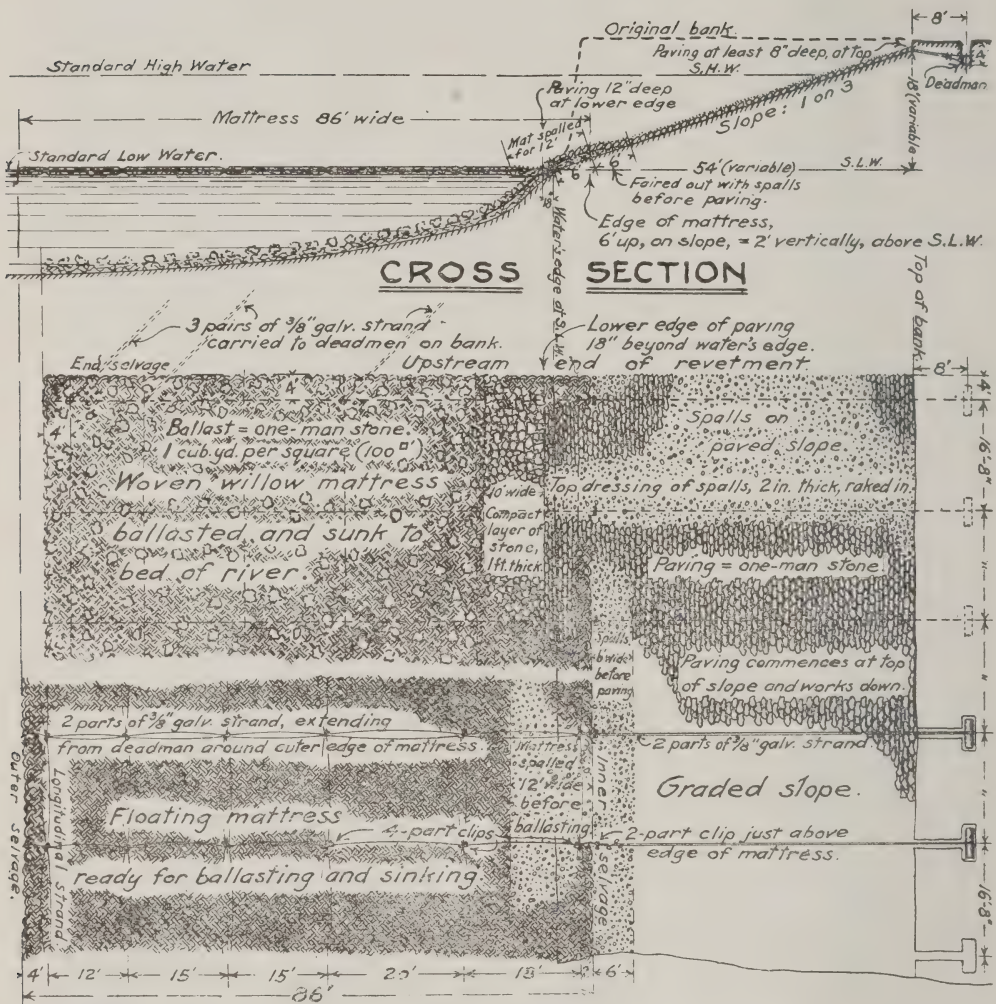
Plate I. General Plan, Standard Revetment. (Missouri River Improvement. U. S. Engineer Office, Kansas City, Mo., 1916.)
